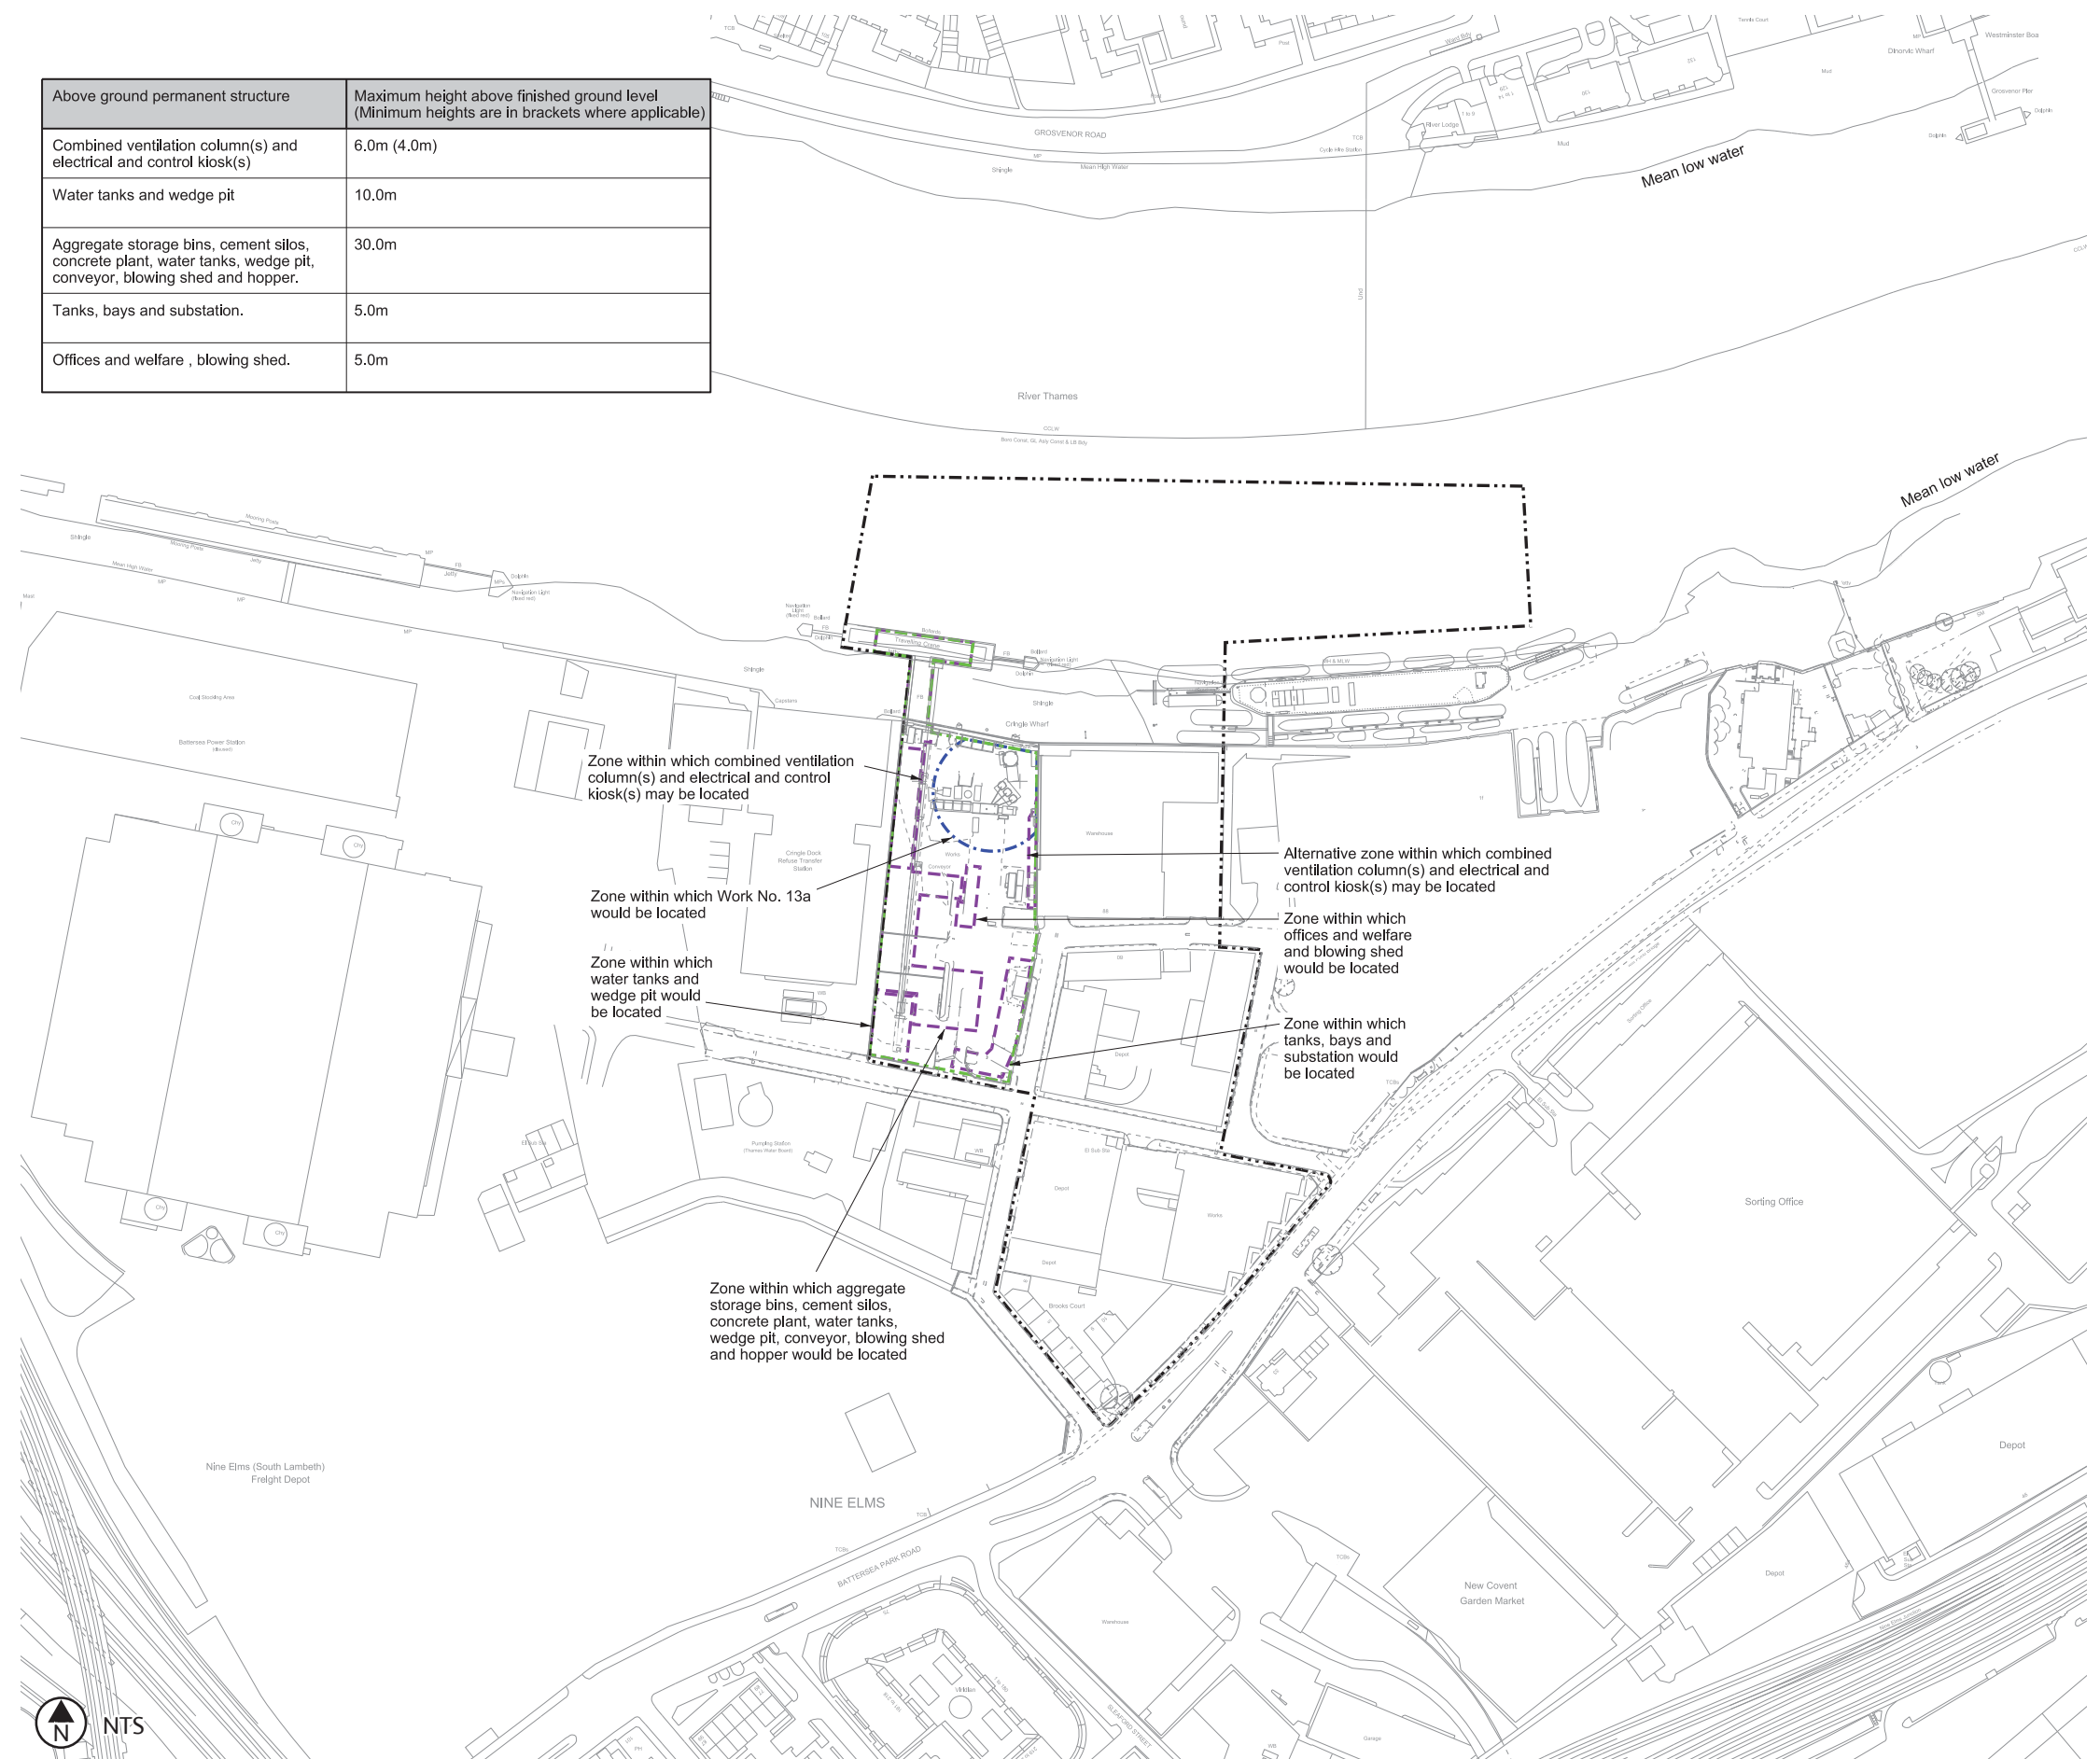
Site works parameter plan - refer to Site works parameter plan in the *Book of Plans
